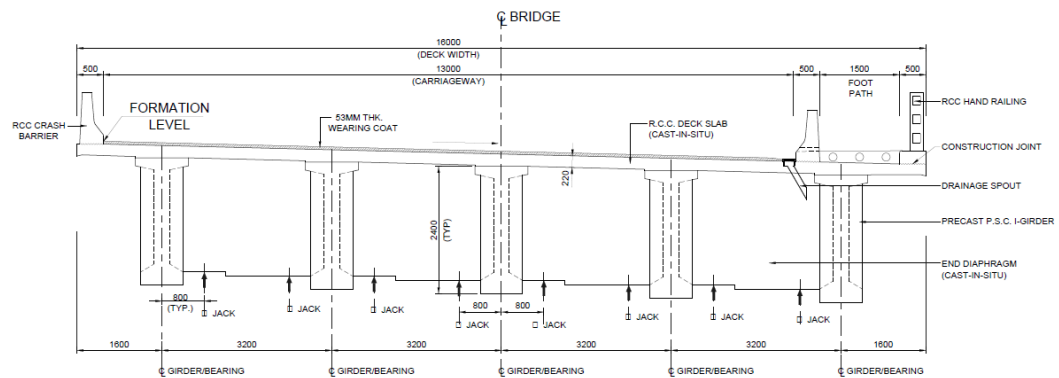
14 Cross section of 40m span OC post tensioned I girder at support
